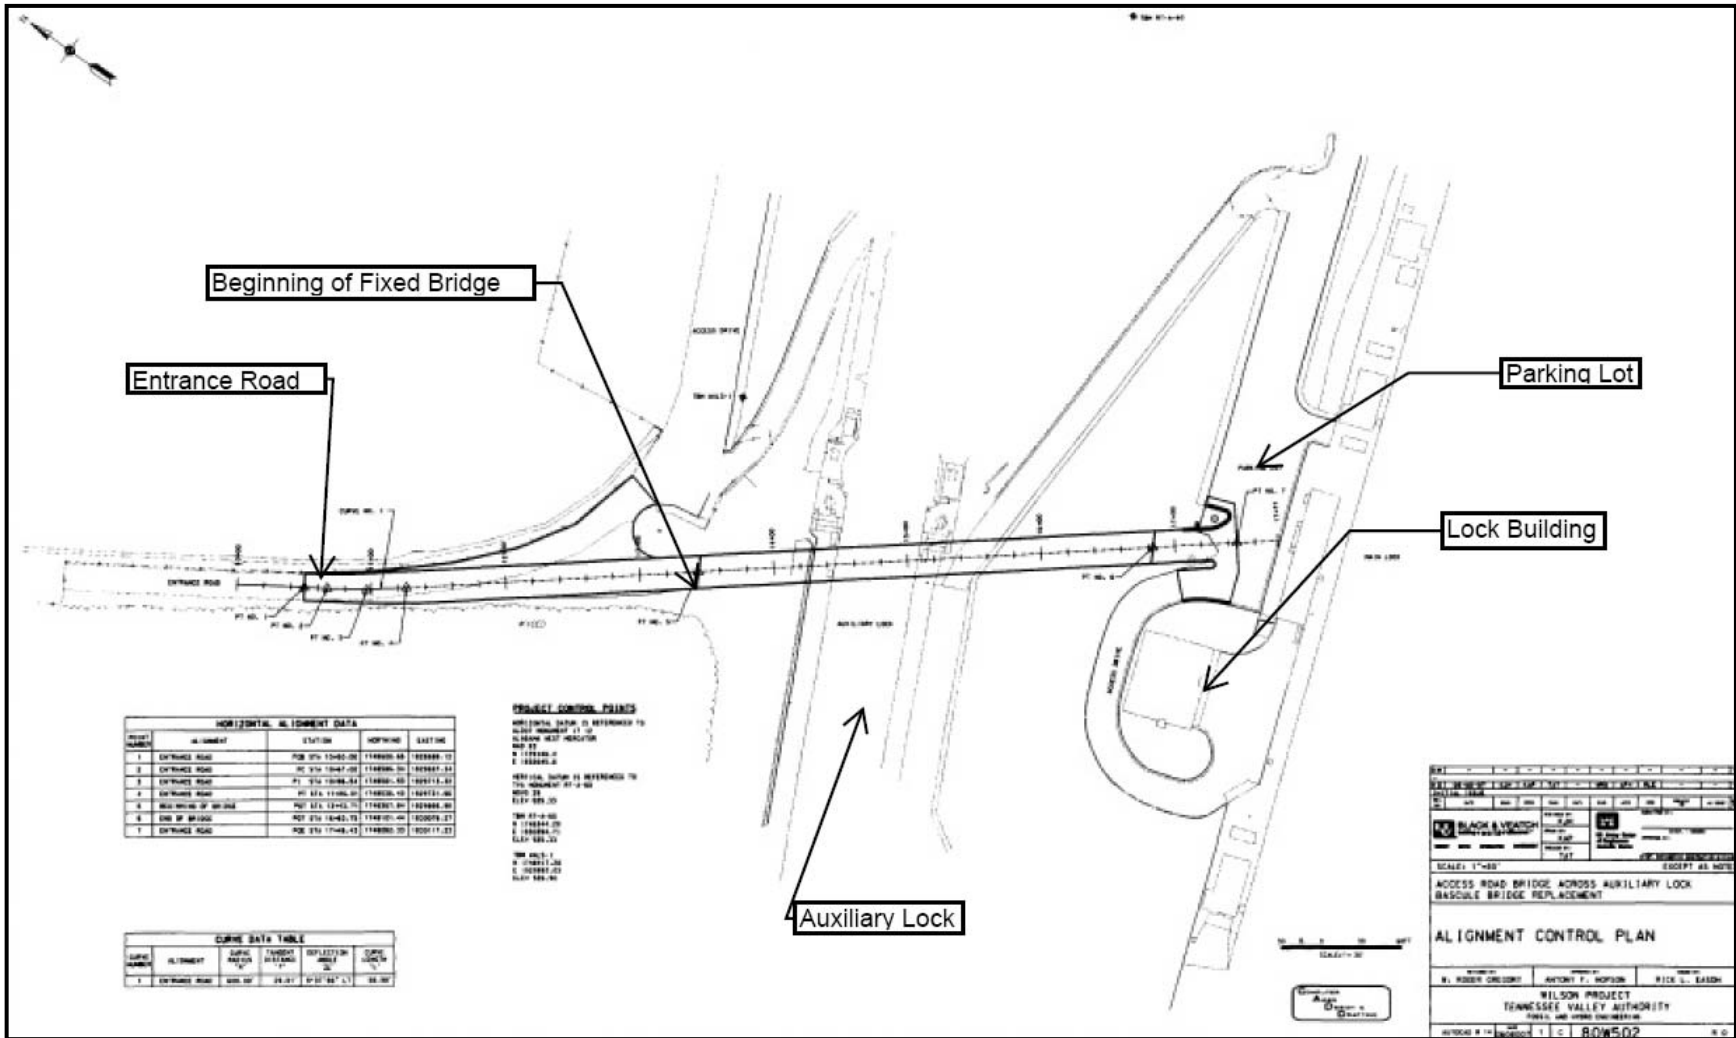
Drawing Illustrating the Proposed Alignment of New Fixed Bridge
